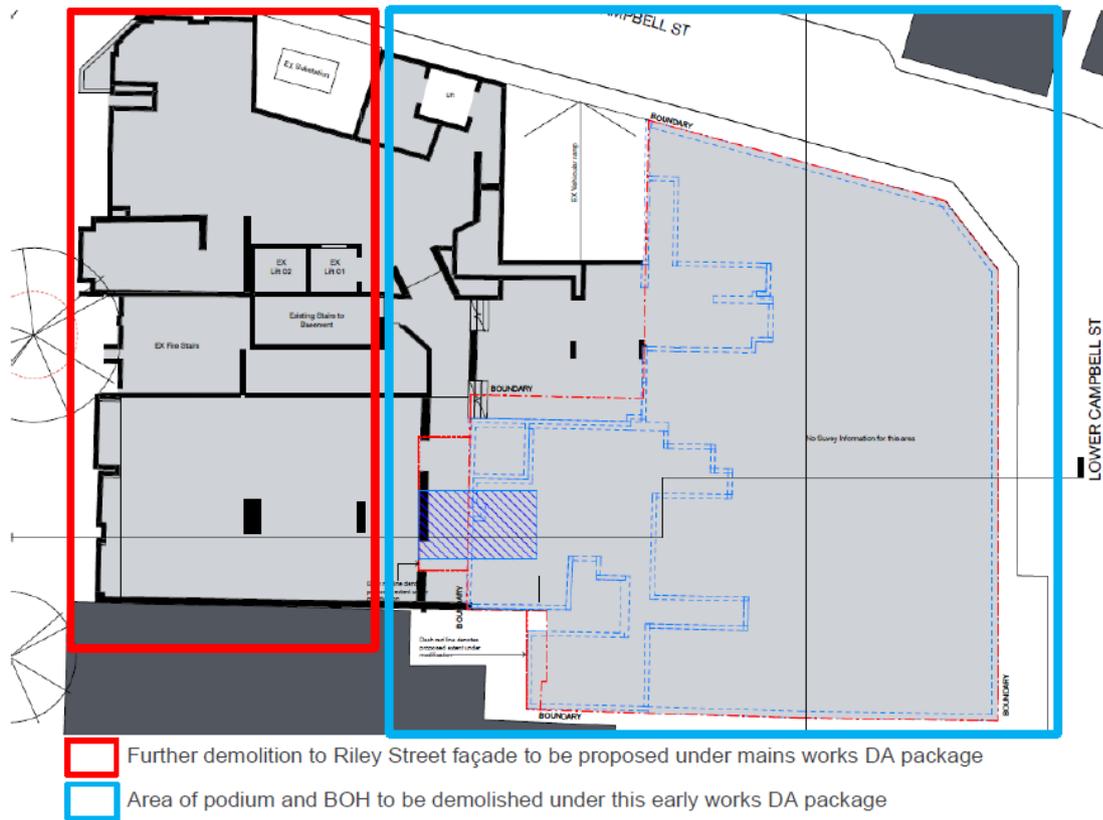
The areas of the subject to demolition are outlined in blue, whereas demolition within the area outlined in red is covered by the detailed design application D/2018/1451
